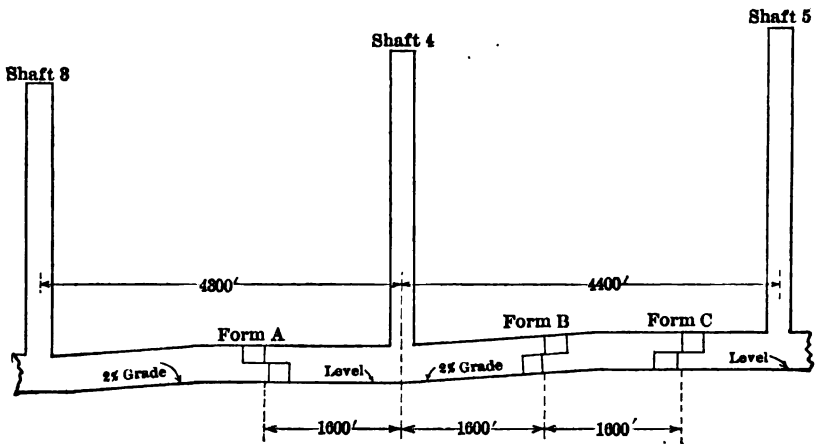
Contract 47. Profile of Portion of Walkill Pressure Tunnel, Showing Position of Forms for Concreting Lining.
